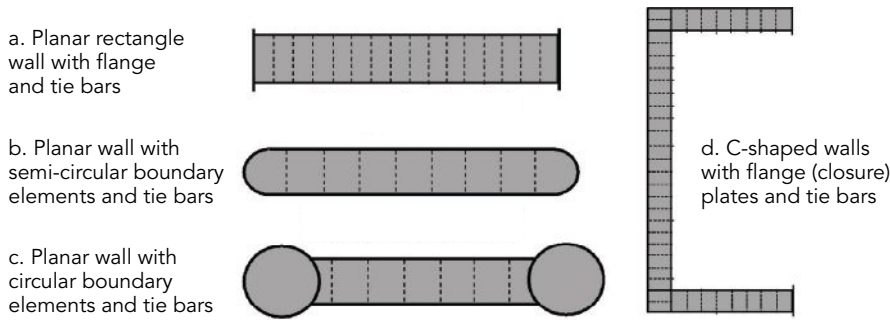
Example cross-sections of C-PSW/CF walls (uncoupled).
